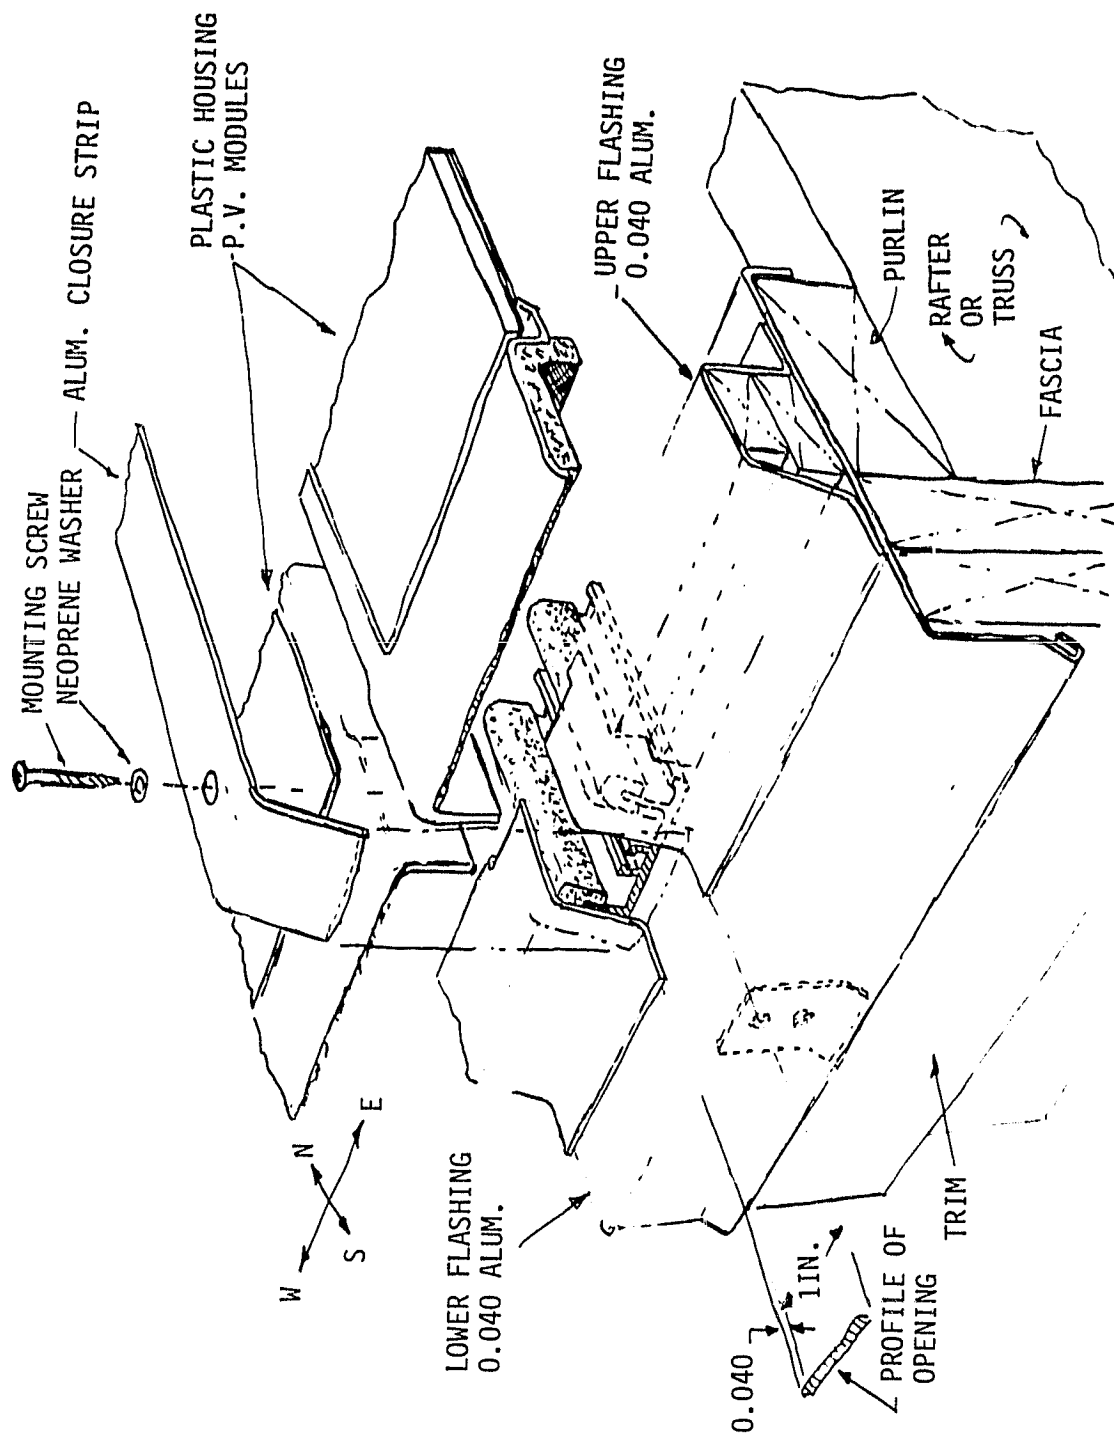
Installation Details for Concept No. 2 (Pictorial View at Eave)
